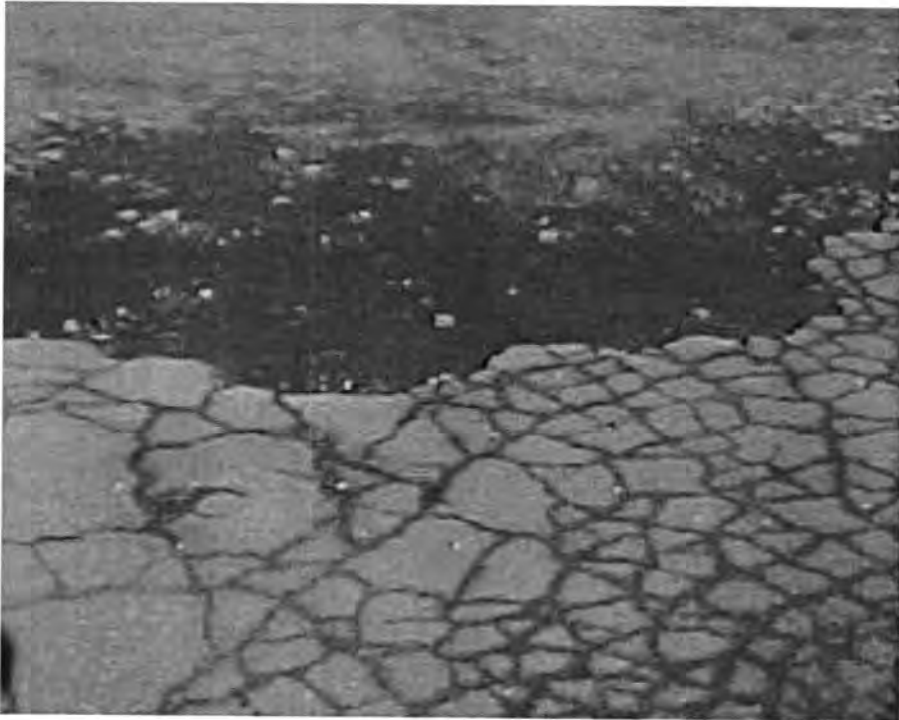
Existing Asphalt Pavement Showing Pothole and Fatigue Cracking
